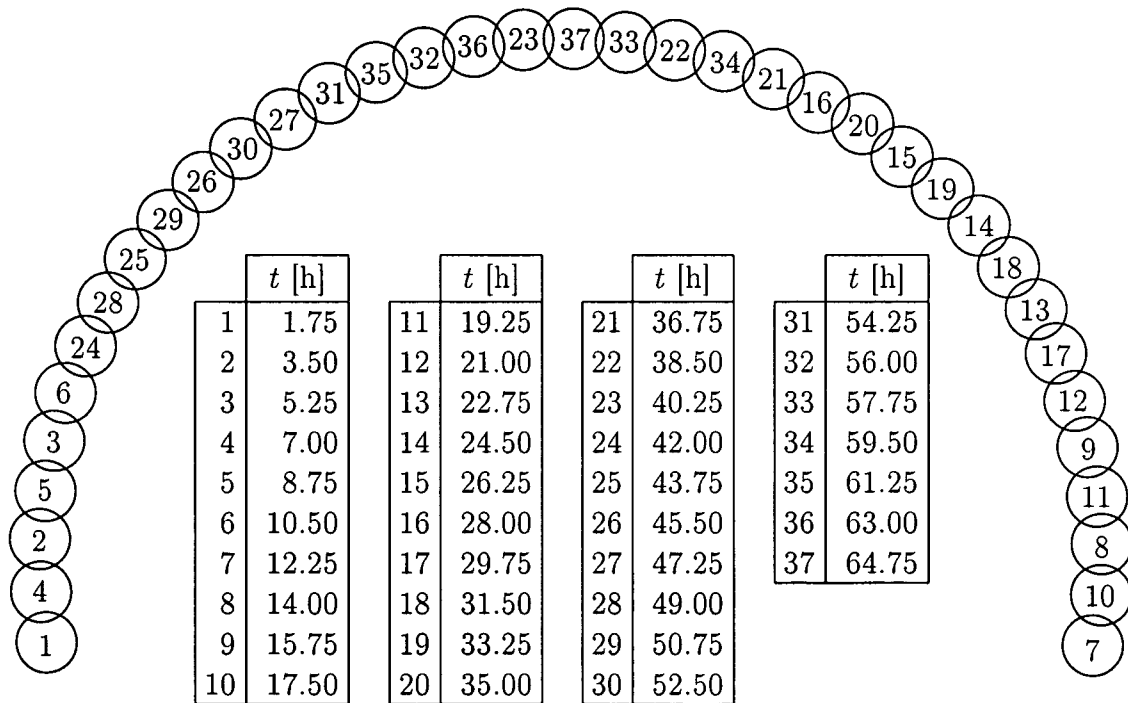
Numerical simulation of the tunnel excavation with HJG: jet grouting scheme for construction of support ring consisting of 37 jet grouted columns
